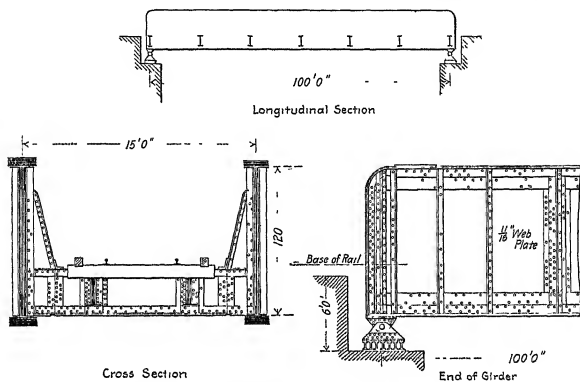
SINGLE-TRACK RAILWAY PLATE-GIRDER BRIDGE
